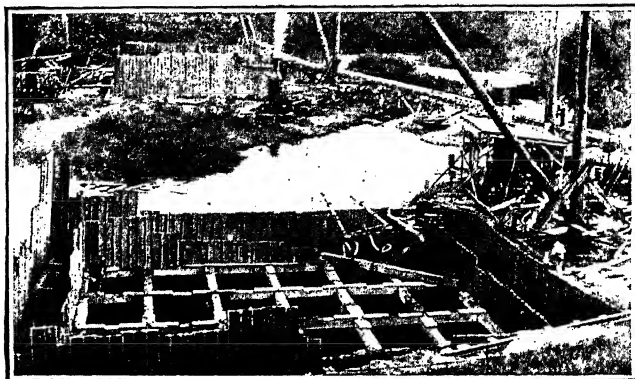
Telescoped sheet-pile cofferdam, Tunkhannock Viaduct.
